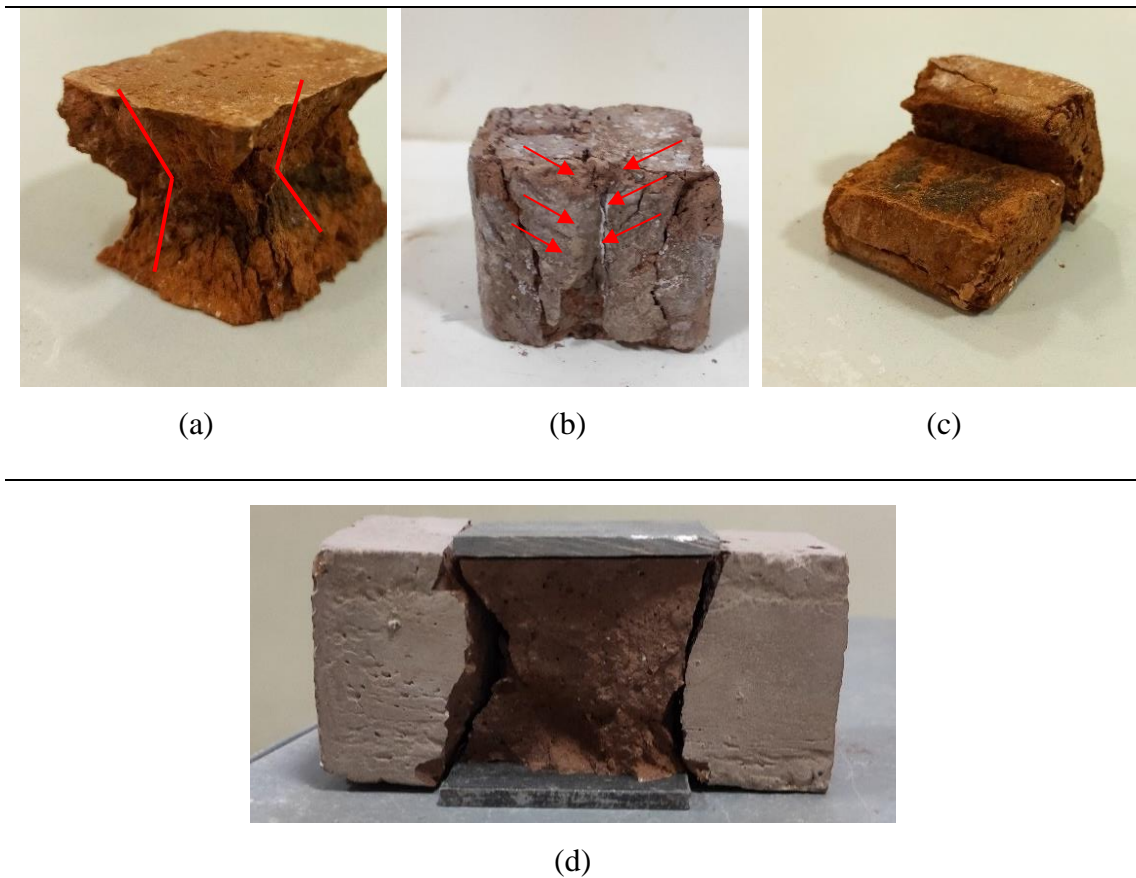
Representative images showing details of failure mode of compression test specimen in a) perpendicular b) parallel c) lateral direction d) casted specimen
